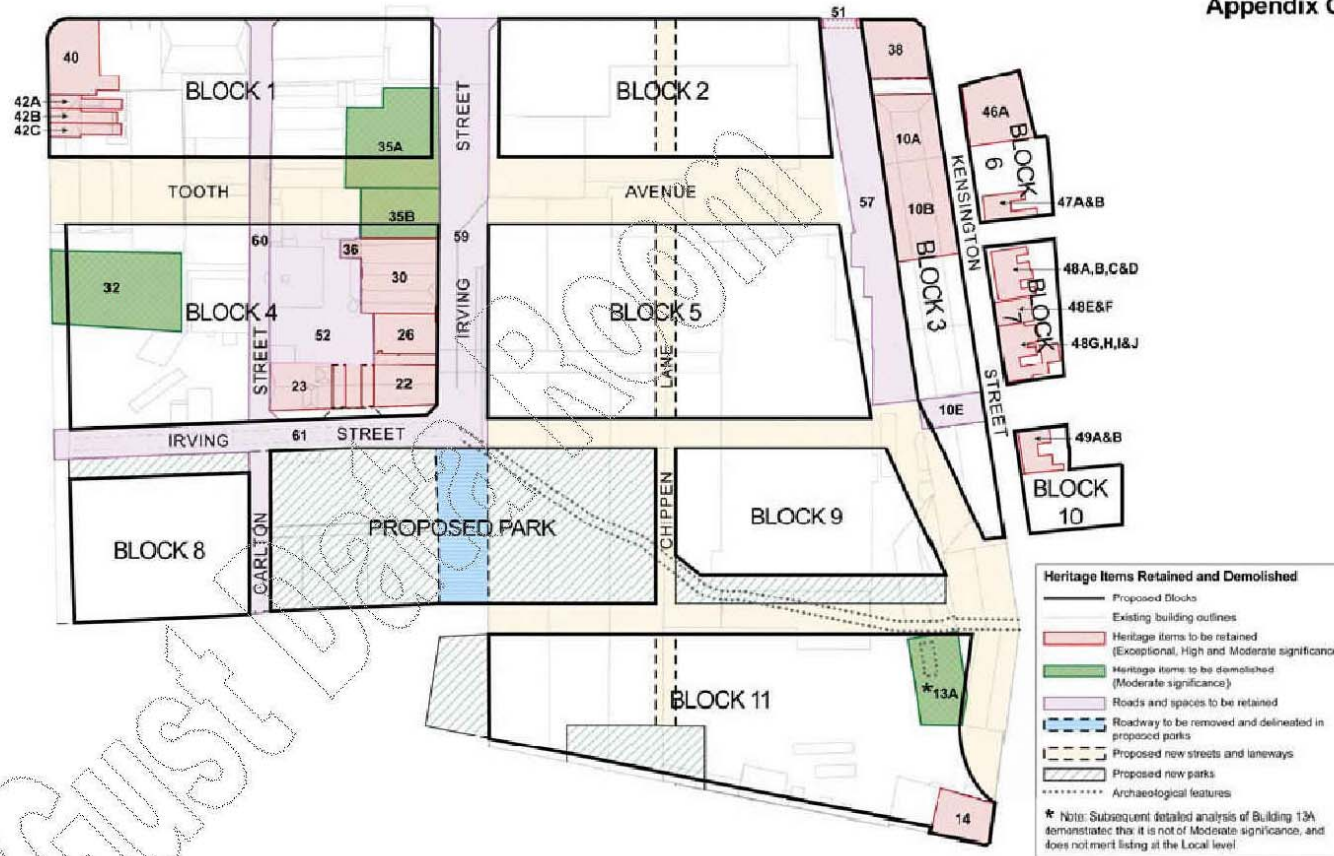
Site plan showing existing elements and precinct boundaries. (Baseplan courtesy of NBR&P)
